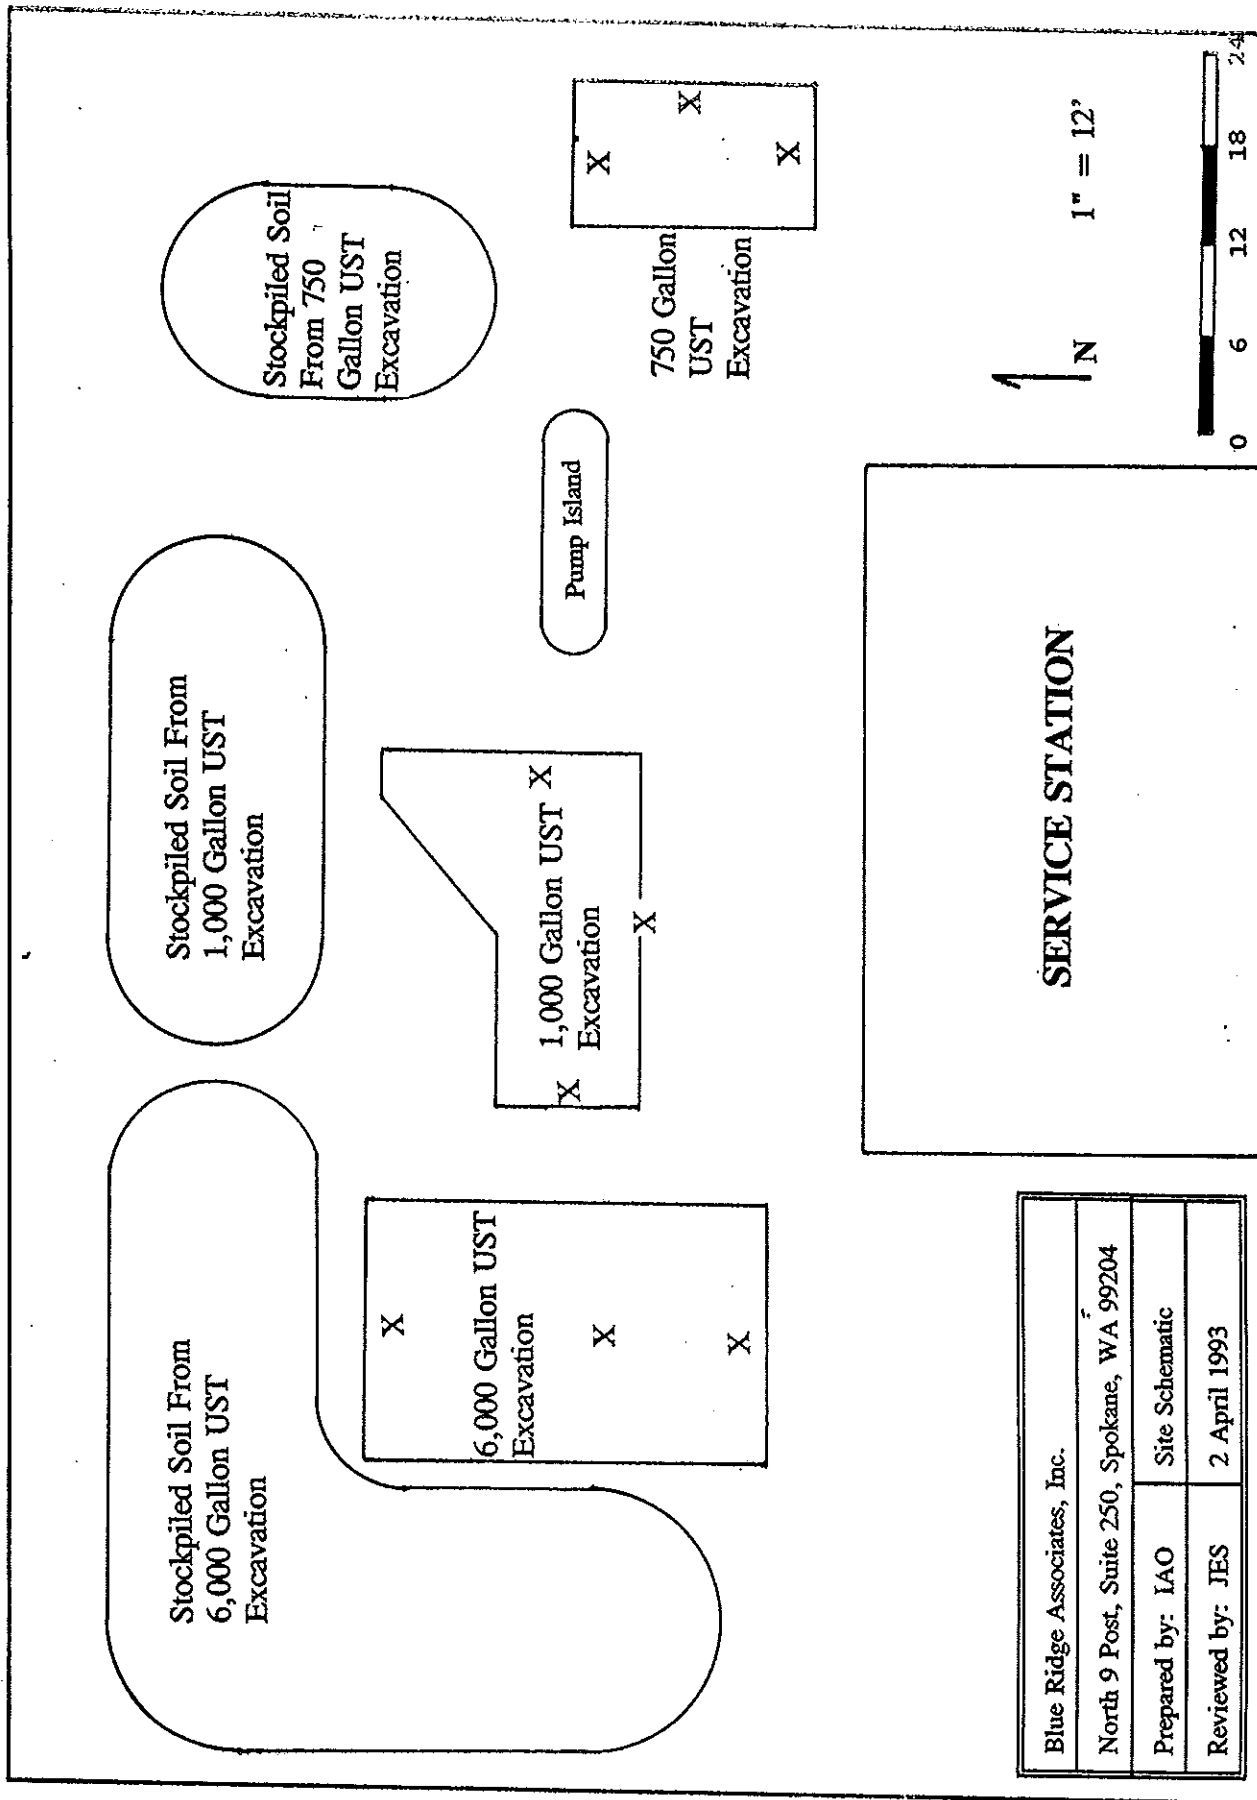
Site plan showing locations of excavation pits in relation to the building.
